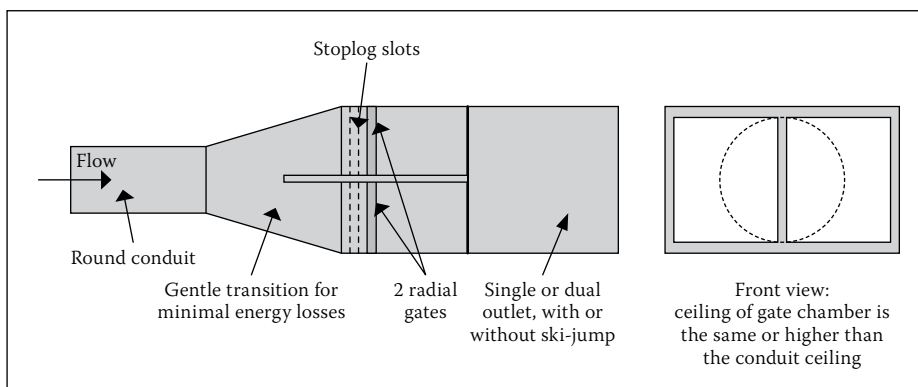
Possible radial gate configuration at the downstream end of an outlet conduit to prevent air blowback in the air vent of the conduit
